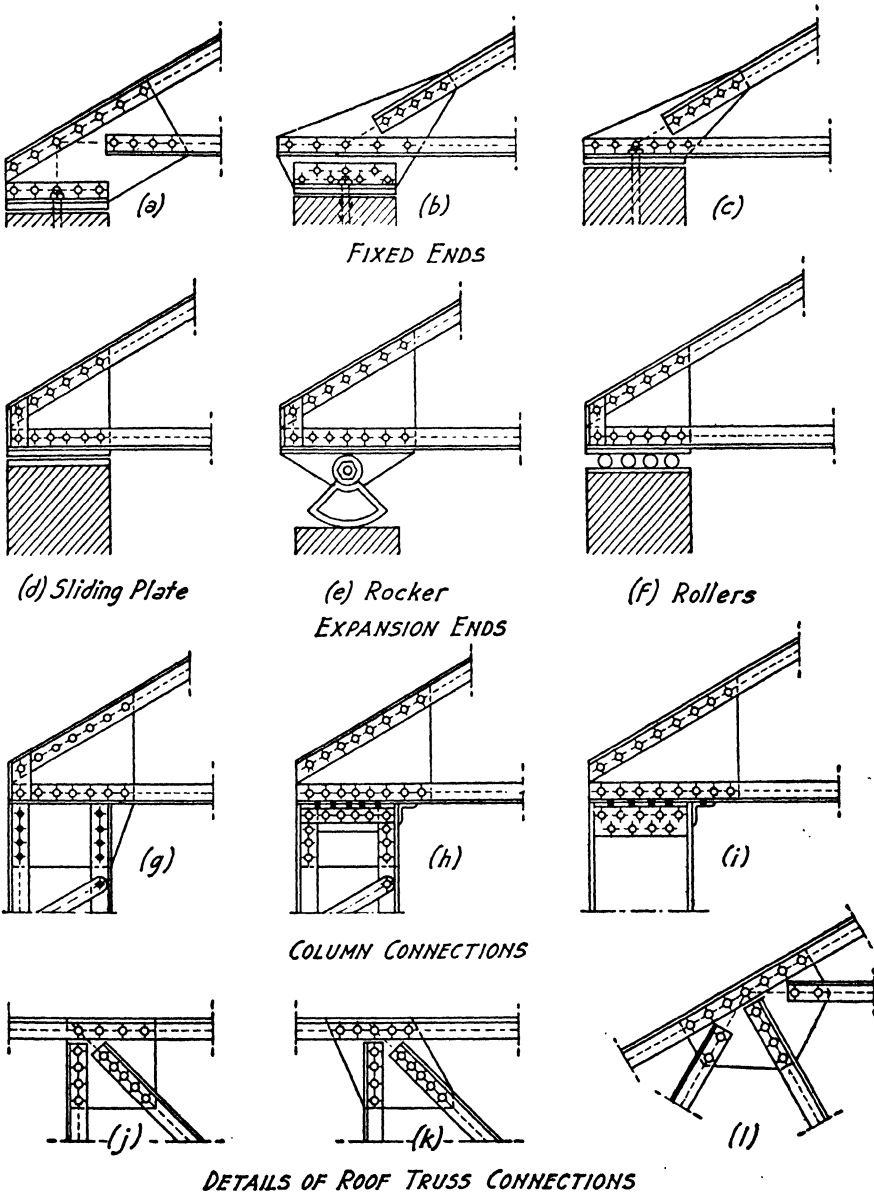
DETAILS OF TRUSS CONNECTIONS AND JOINTS.
